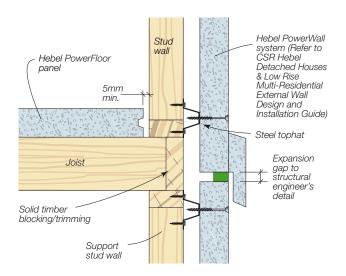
Fitted Flooring with Internal Loadbearing Wall
